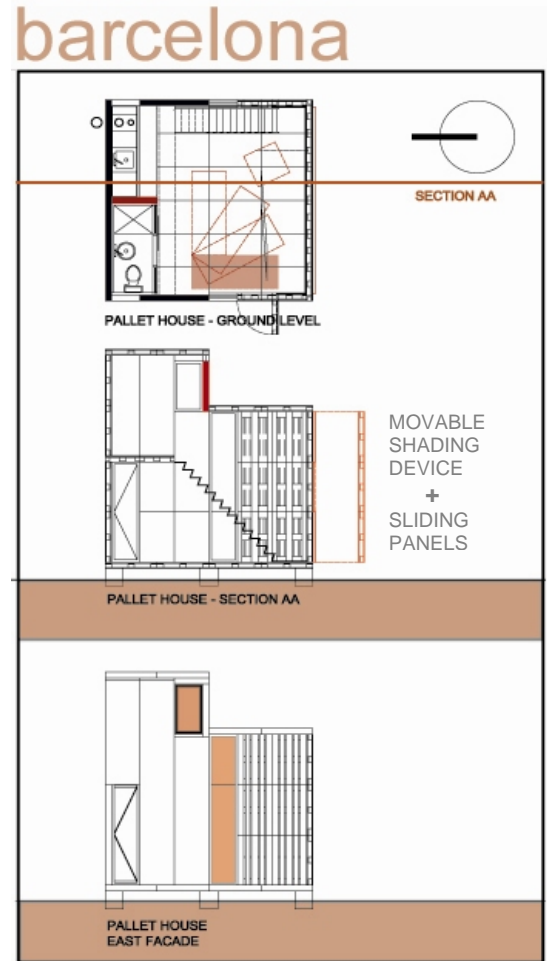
Plan, section and side elevation of PHS@ Barcelona case. The south façade contains a movable shading device and sliding opaque panels, providing privacy. Source: Suau.
